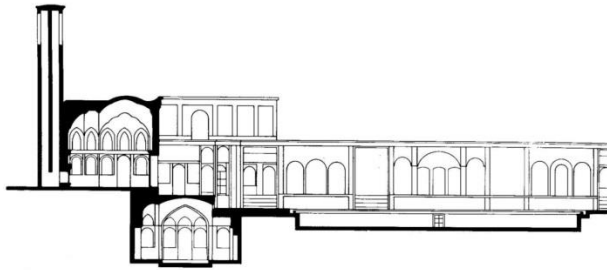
Winter Part Section (Section A_A) in Broujerdi house Kashan (URL 18)
